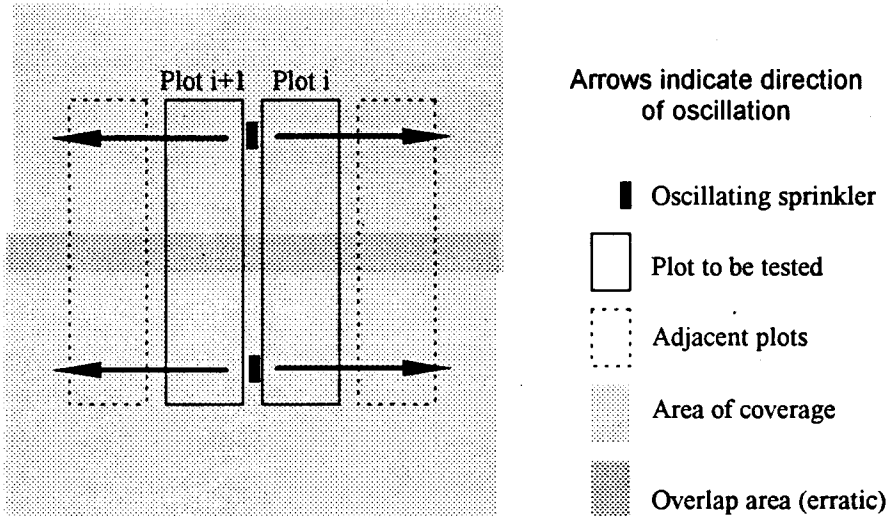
Plan view schematic of placement and coverage of sprinklers
